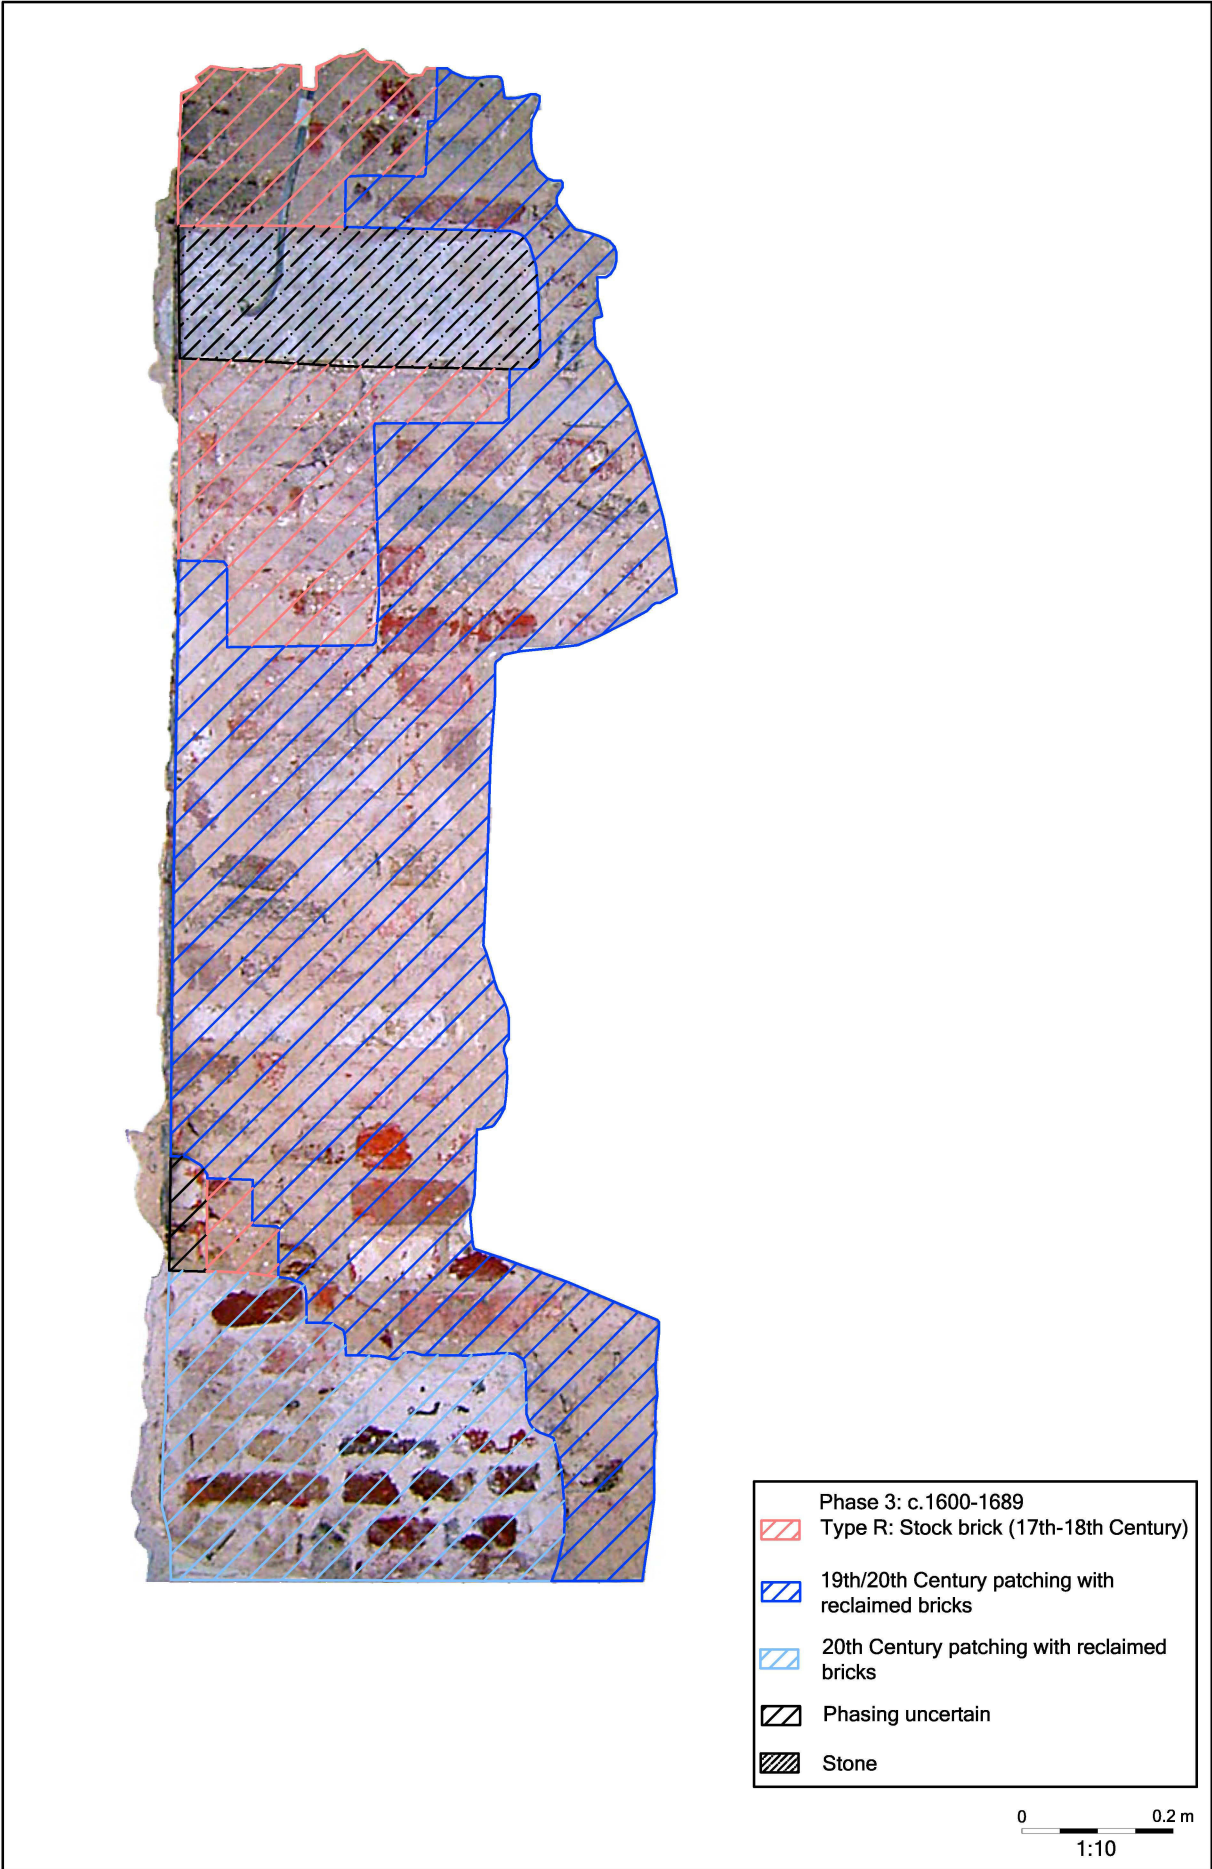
West elevation, second floor, internal exposed brickwork to north of window
